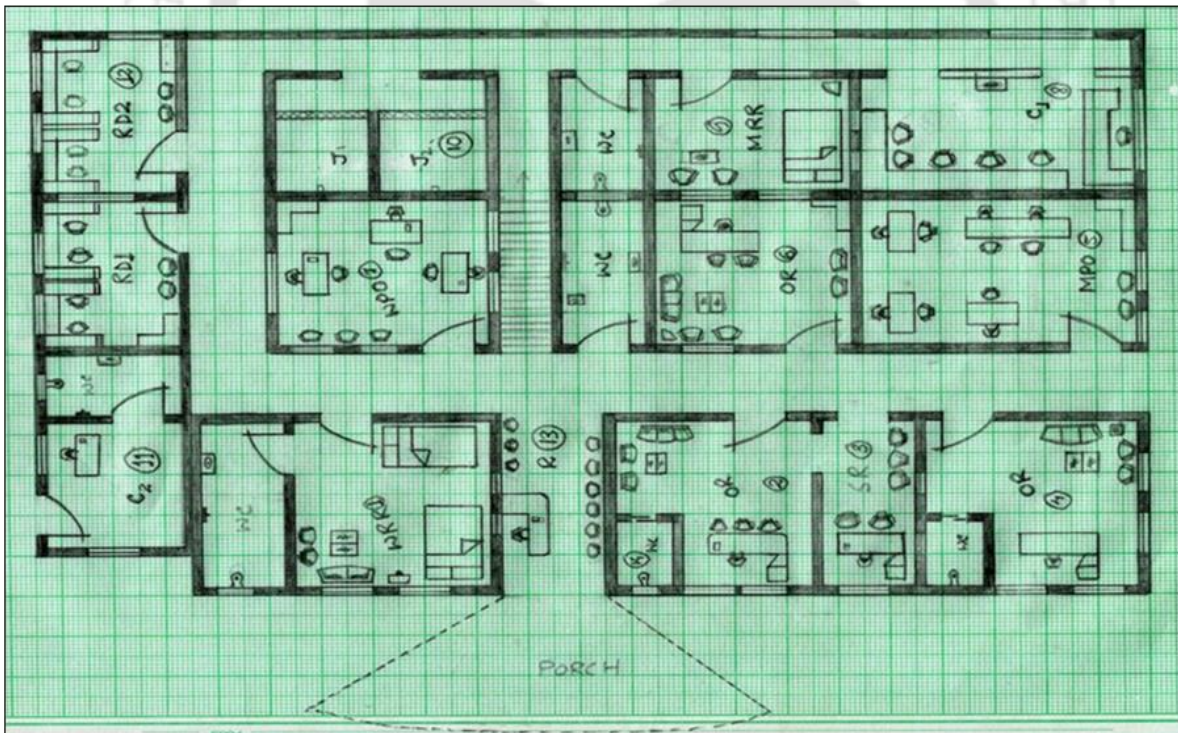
Overview of a schematic layout of after implementation of proposed design intervention. Layout under consideration: concept, (Design layout of a Pan Bazar police station along with arrangement of furniture, fittings and fixtures)
